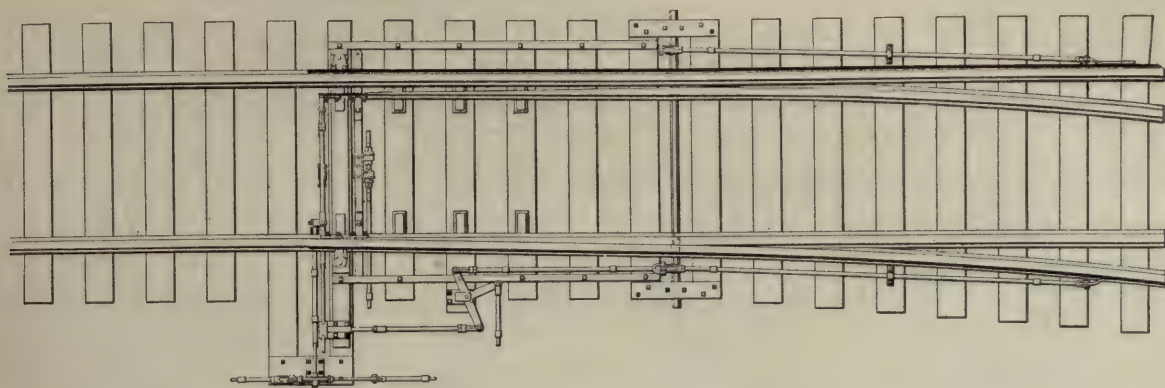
Outside Connected Facing Point Lock and Switch Fittings, with Bolt Lock. Two Detector Bars Behind Points, Moved by a Rocker Shaft.
